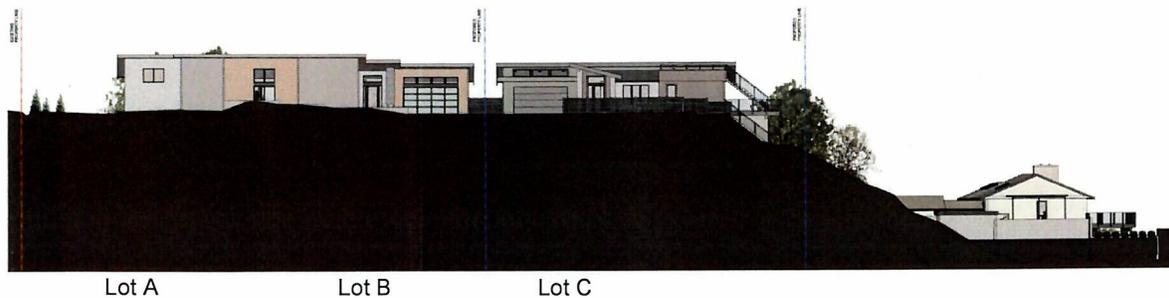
North Development Elevation (from plans by Ryan Hoyt Designs Inc.)
